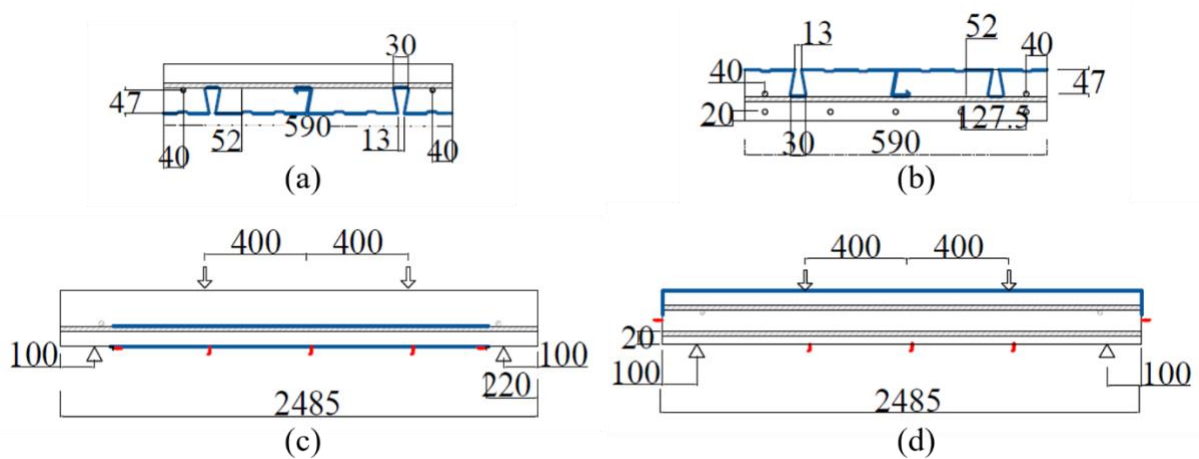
Cross-section of: (a) sagging, (b) hogging and elevation view of: (c) sagging (d) hogging test specimen.
